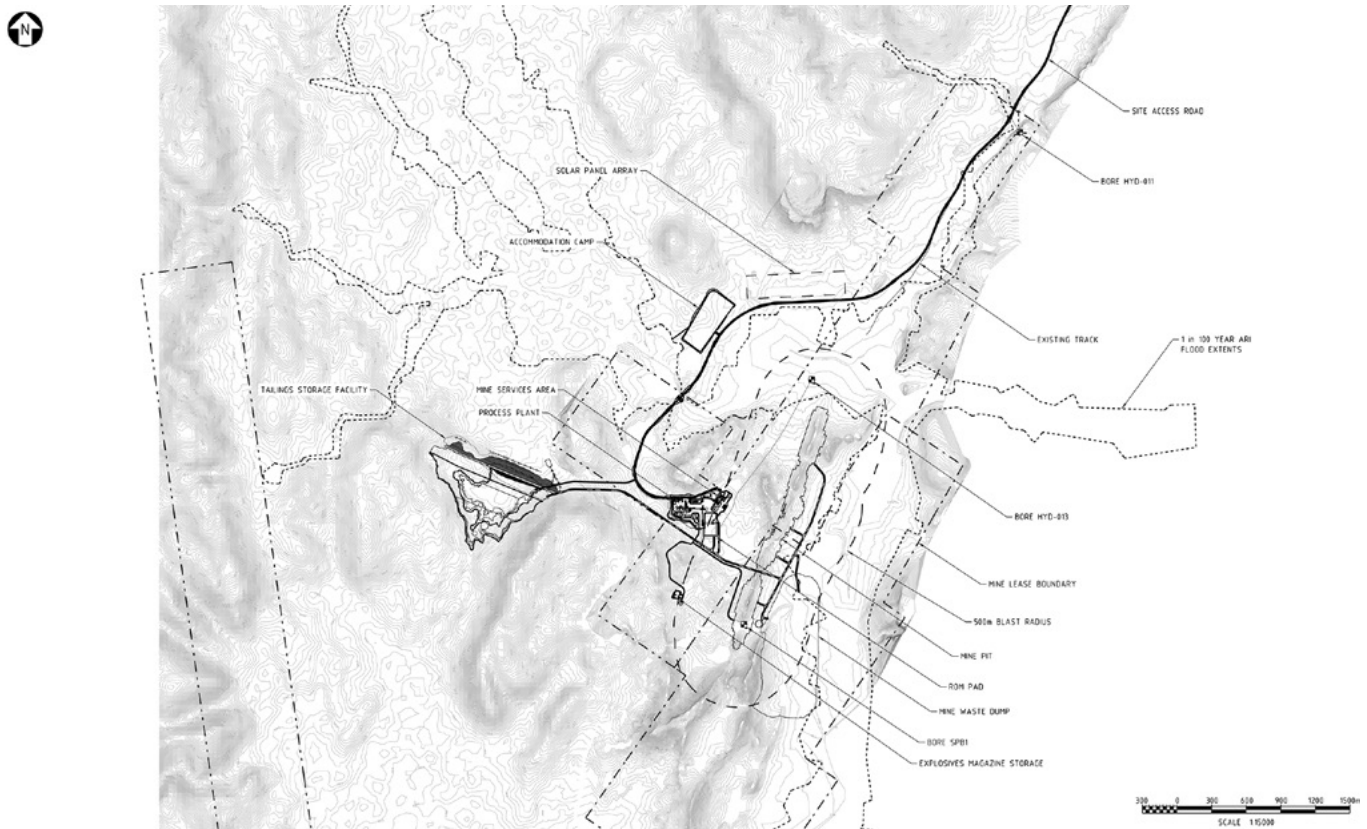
Site plan showing locations of key work areas for the Speewah Fluorite Project
